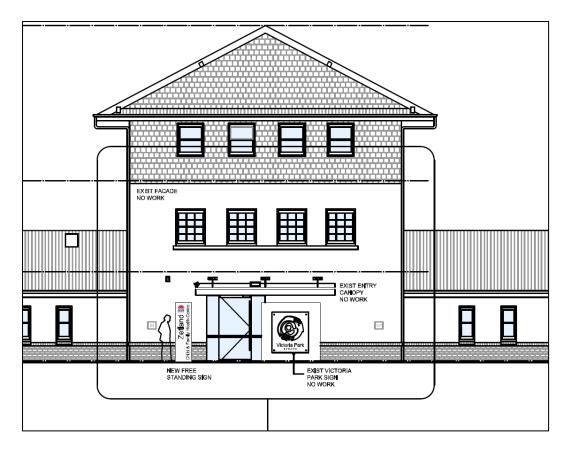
Proposed signage adjacent to the primary Joynton Avenue entry. It is noted that the existing 'Victoria Park' sign adjacent to this entry is not proposed to be modified.
